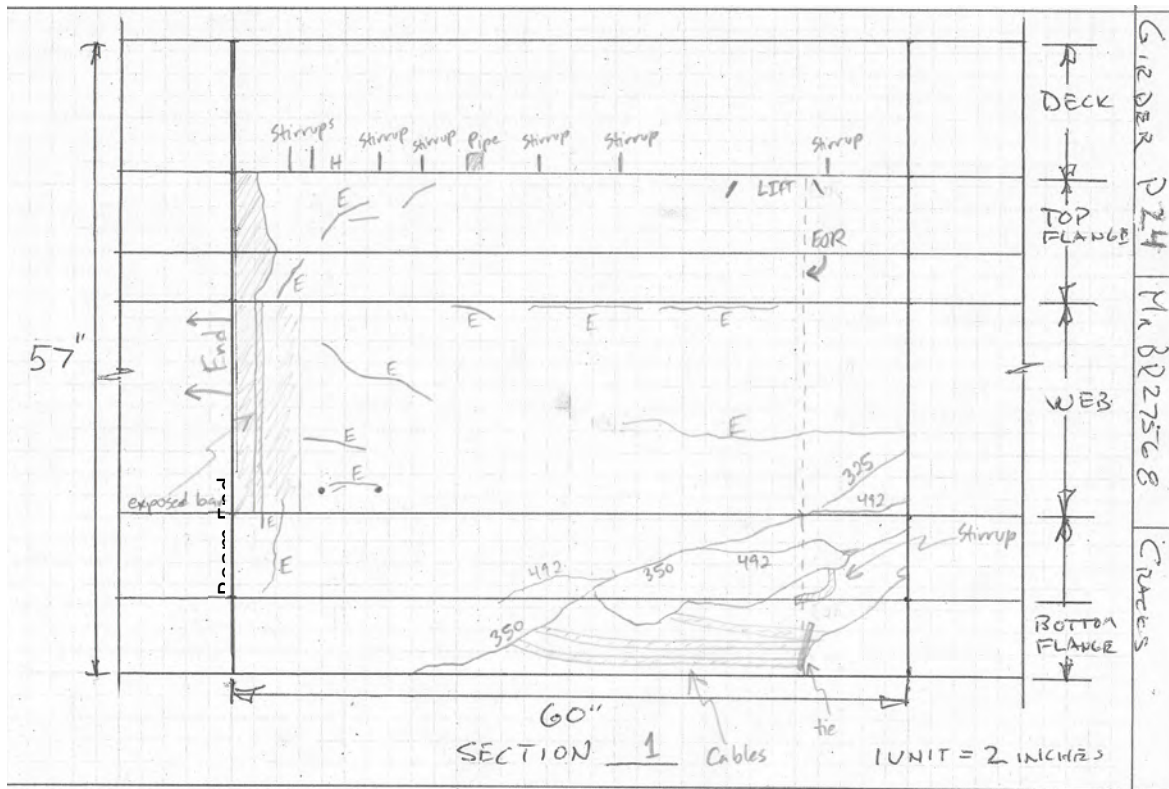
Girder P24 crack pattern – Section 1 (See Figure 3.4 for Section limits)
